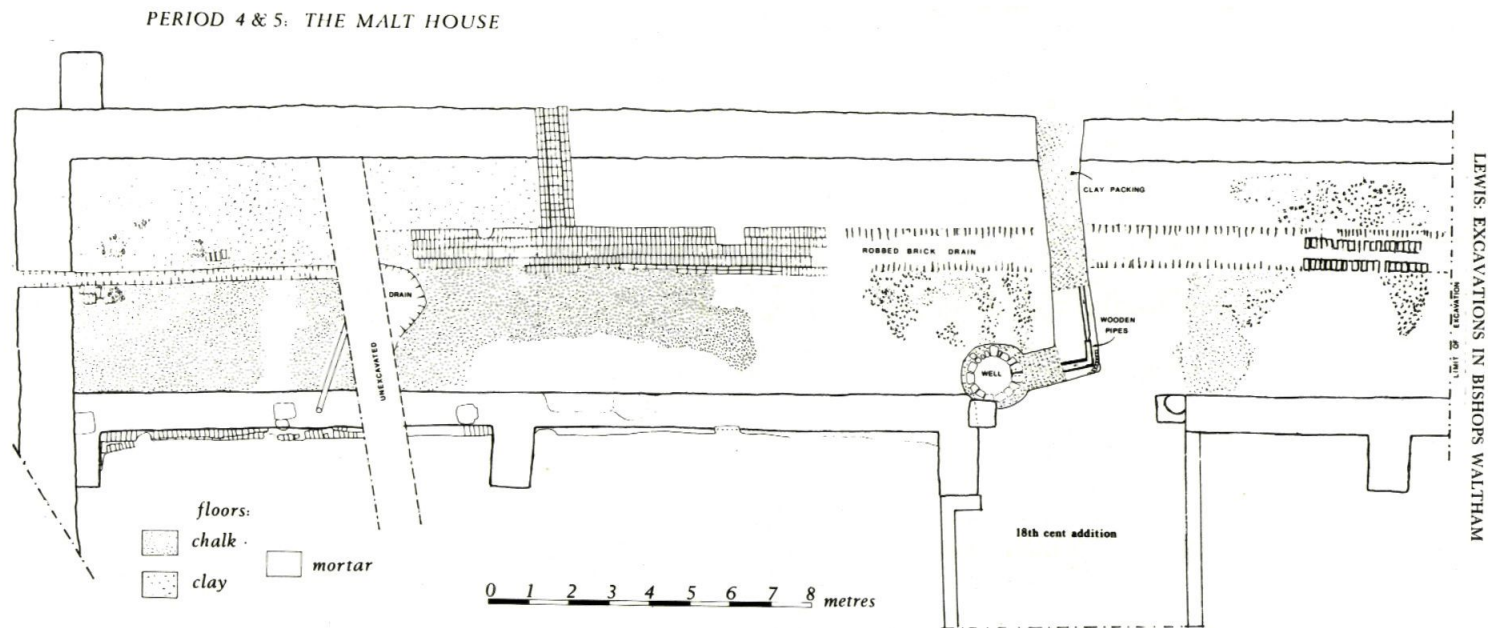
Bishops Waltham: site 5, plan of the brick building in Periods 4 and 5, and in its last phase as a malthouse.
